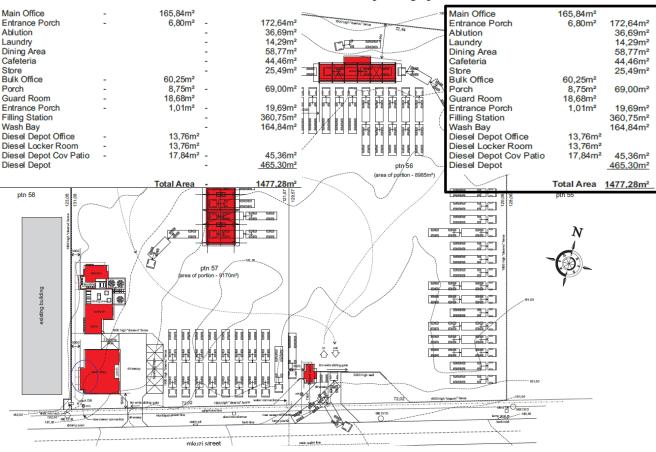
The site development plan (SDP) with the reported planned areas to be covered by the proposed development on Erven 56 and 57 in the Mossdustria complex.
